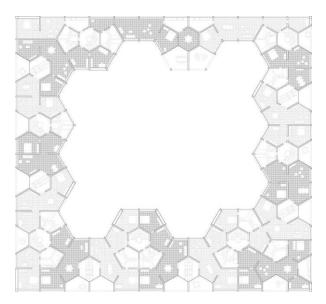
Apartment Building in Brünnen, plan of the typical storey. (http://www.archdaily.com/138771/apartment-building-in-brunnen-kit/)
